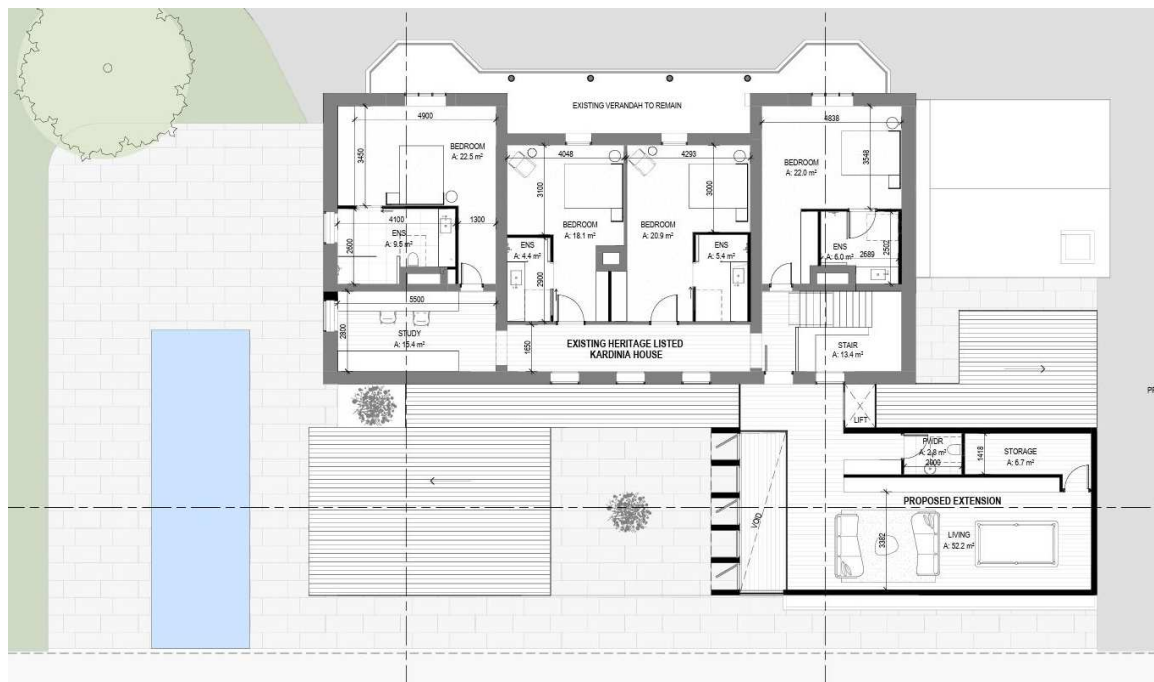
Proposed first floor works to Kardinia House. Note the alterations to provide ensuite bathrooms. Source: Plus Architecture.
